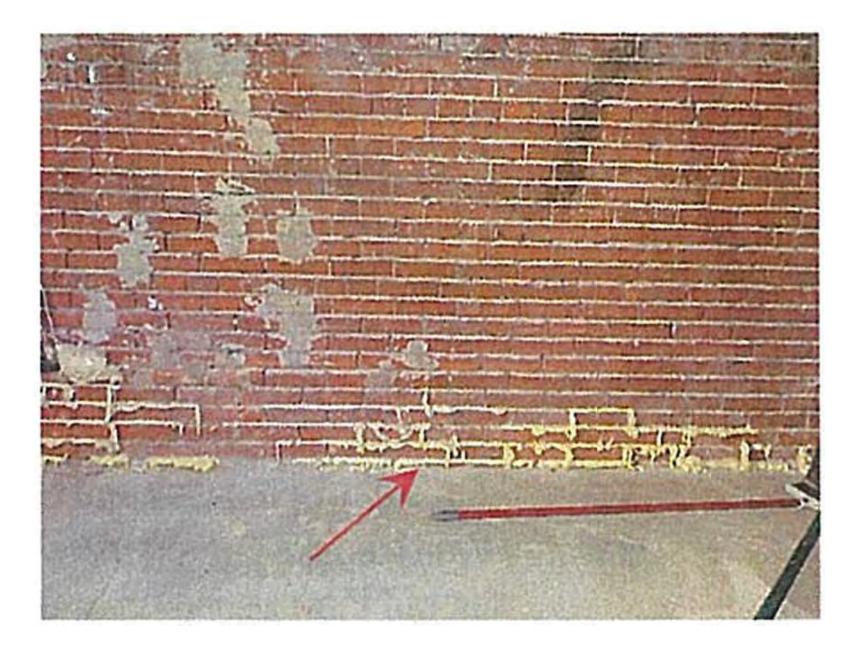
Basement of 504 structure, showing stone rubble footings, sinking foundation, and foam expanding insulation sprayed between bricks rather than appropriate mortar.
